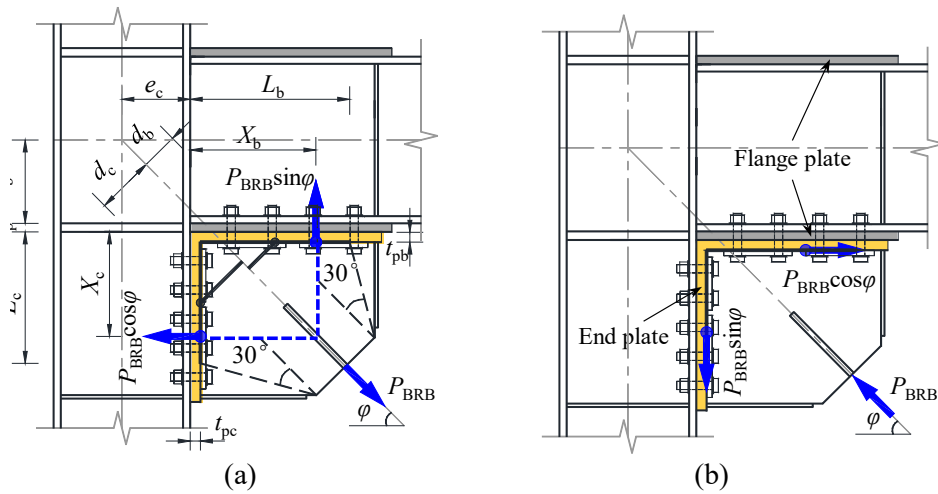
Assumed force transfer at sliding gusset connection: (a) brace tension, (b) brace compression
